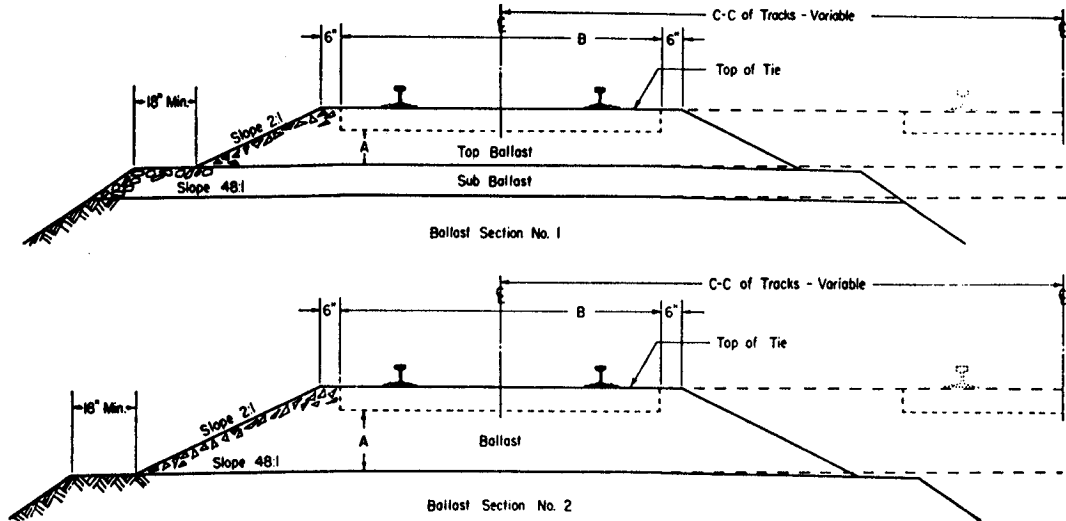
AREA ballast sections, single and multiple track, tangent.
